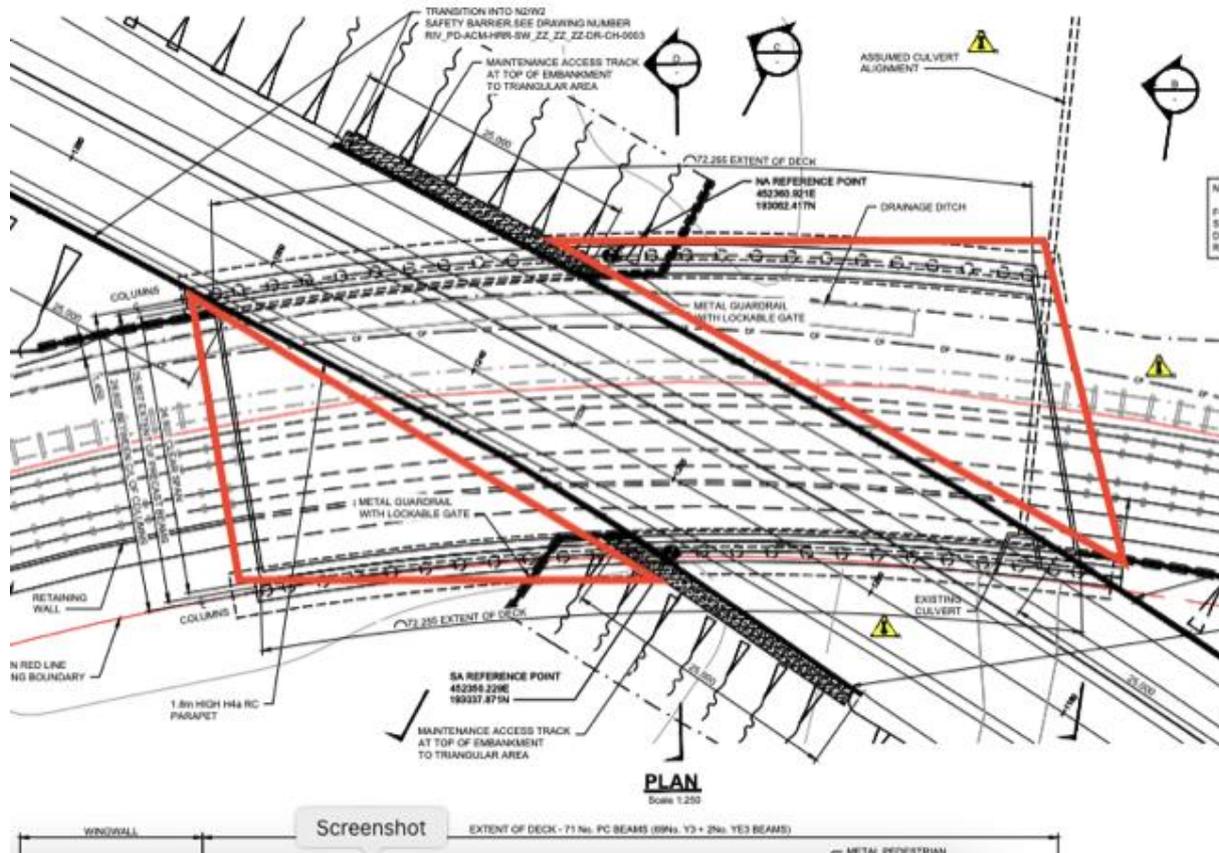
Plan view of the proposed bridge over Appleford sidings showing wasteful areas of structure either side of the road.
